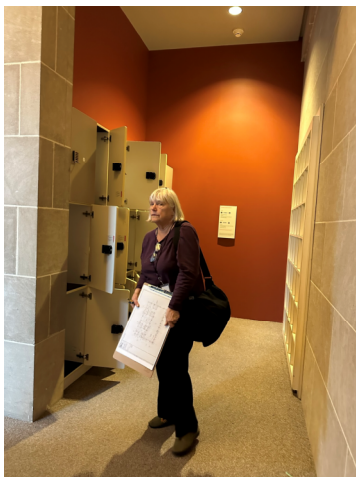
Pantry 0015 alcove. Floor originally was open for revolving coat rack but is now infilled with steel deck and framing below a carpet. We do not have records for the structure between the carpet and the
